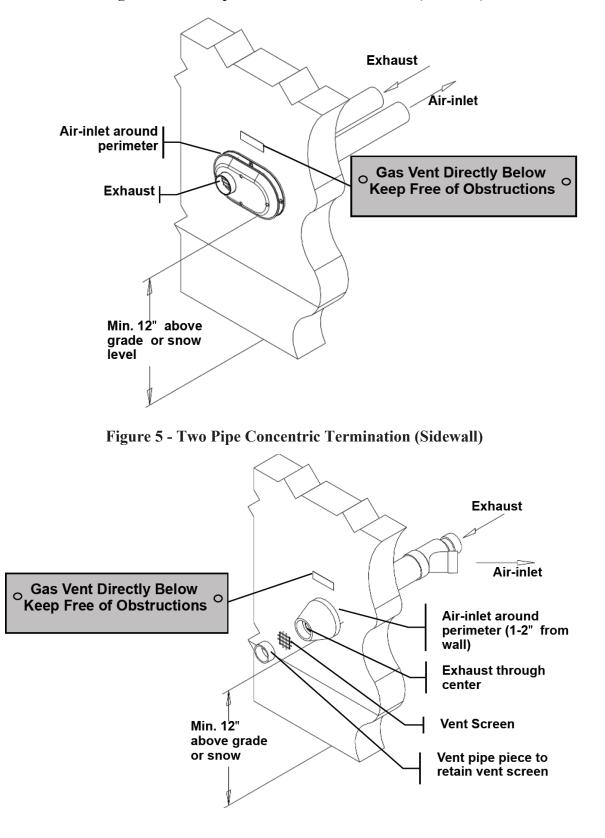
Two Pipe Low Profile Termination (Sidewall)
